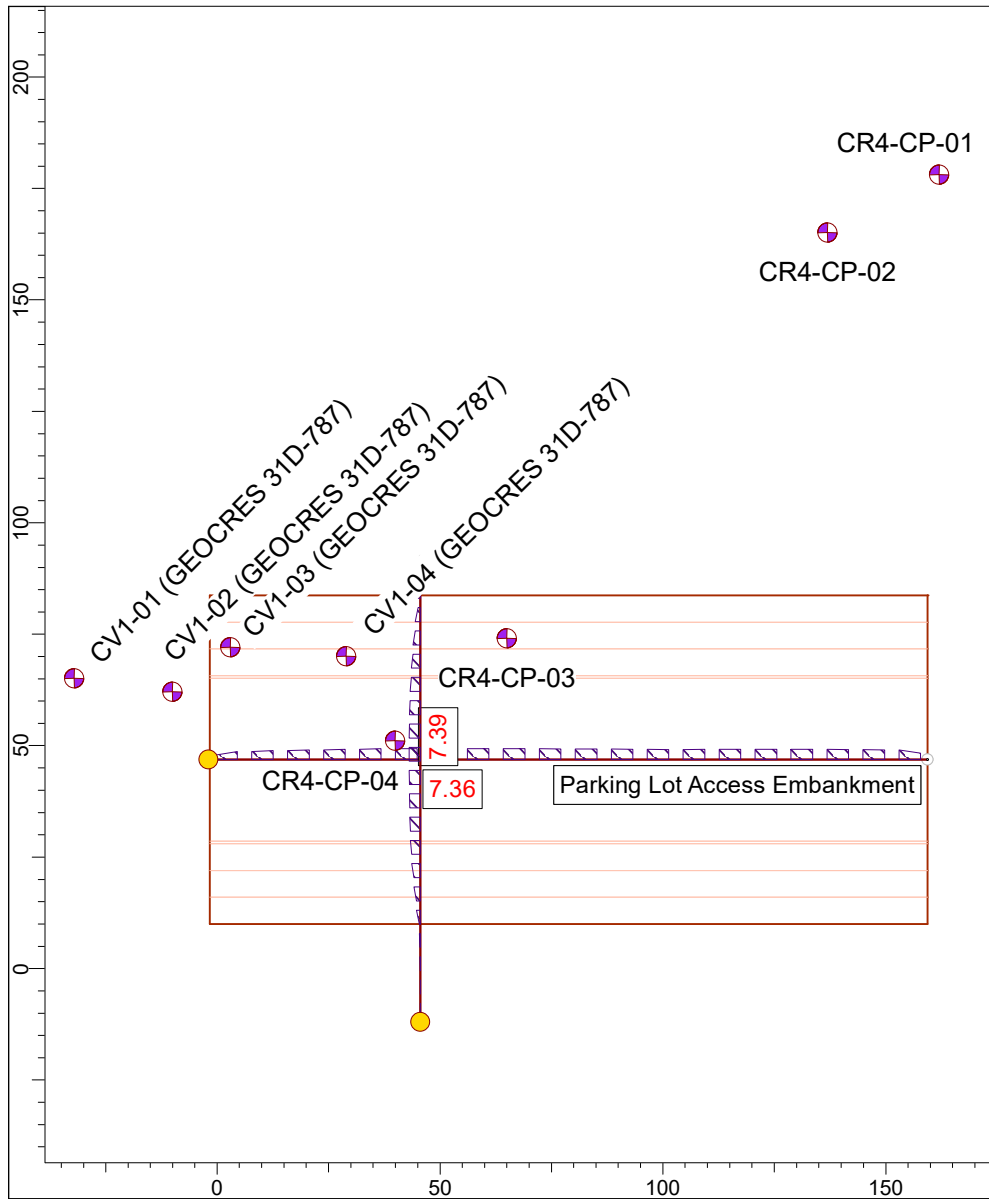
Parking Lot Entrance Road Embankment 15y Post Construction Total Settlement
